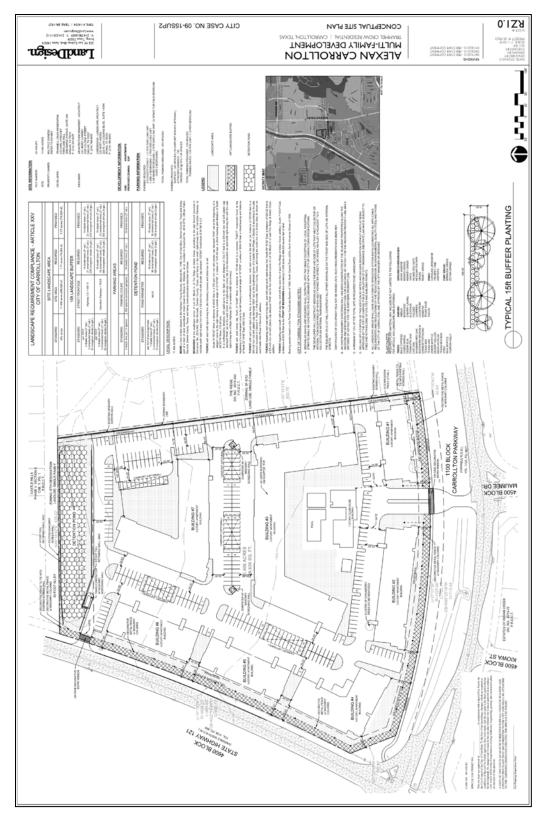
EXHIBIT E CONCEPTUAL LANDSCAPE PLAN
